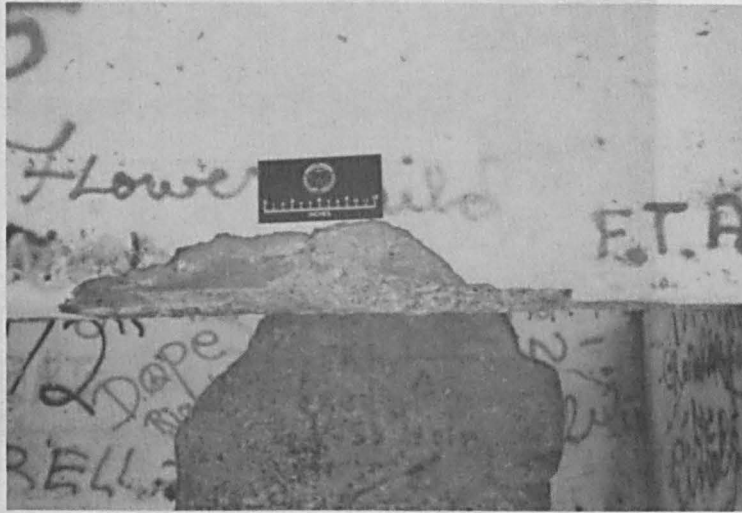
Large spalling of shotcrete surface of abutment
